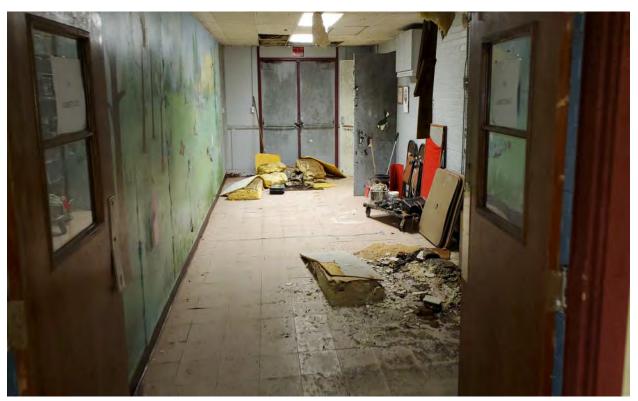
Typical Mold Growth on Walls, Door Components, & Other Surfaces Located Throughout the Main Building.
